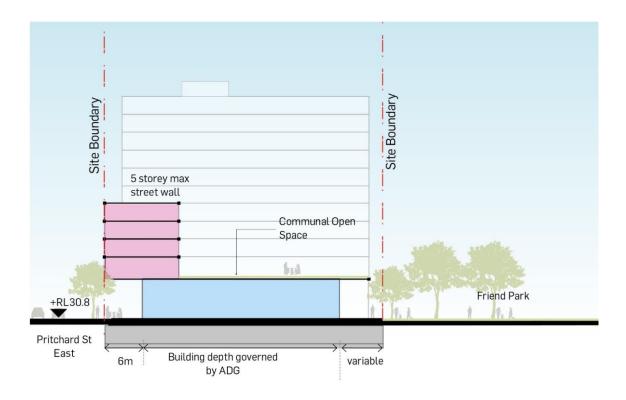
Figure G: Section C-C through Corner of Pritchard Street and Station Street Precinct – typical north–south podium section
